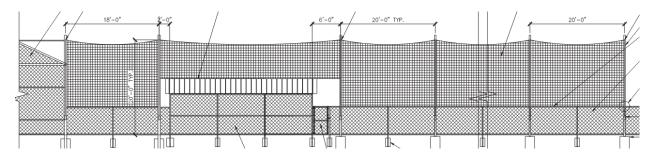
Exhibit B – Elevation of proposed 20 foot tall softball field backstop fencing and netting
